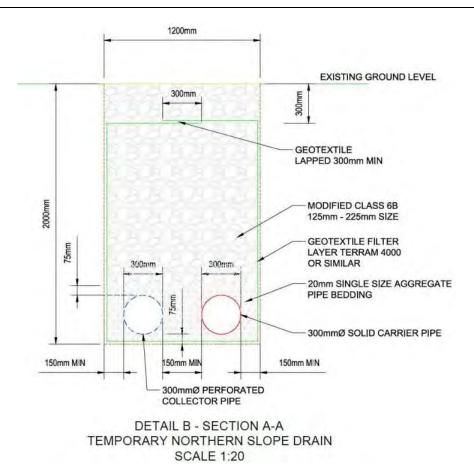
Example of a site specific Counterfort Drain detail to deal with water from a crest cut-off drain via a carrier pipe and also to expedite water picked up by the counterfort getting out of the counterfort via the collector pipe (drawing the authors)
